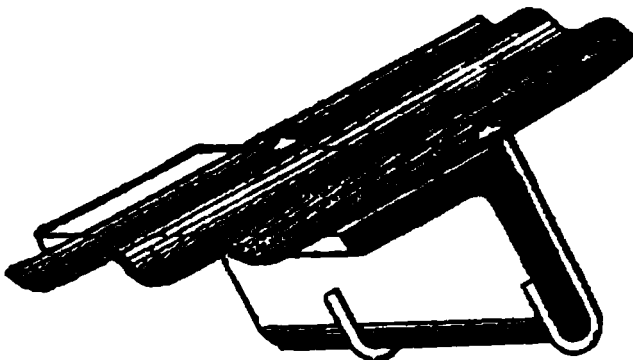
Sheets Fastened to Angle-purlin by Clinch-nails
